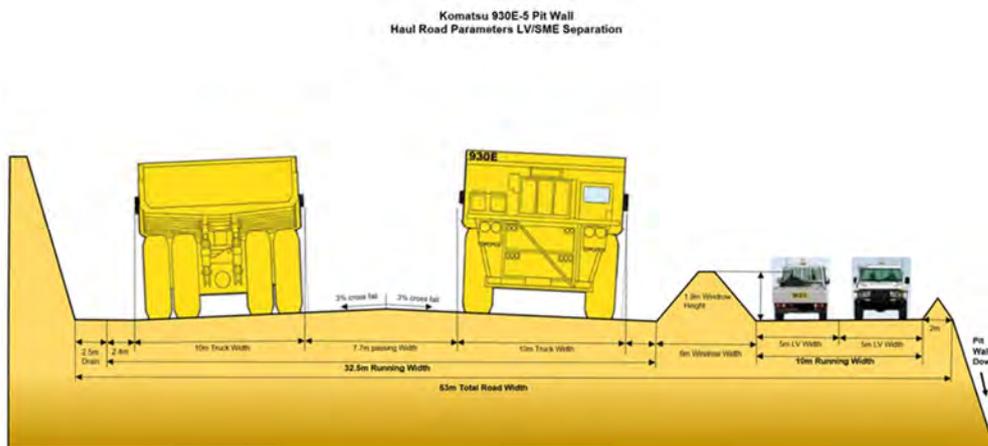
Komatsu 930E Pit Wall (Haul Road Parameters LV/SME Separation)
